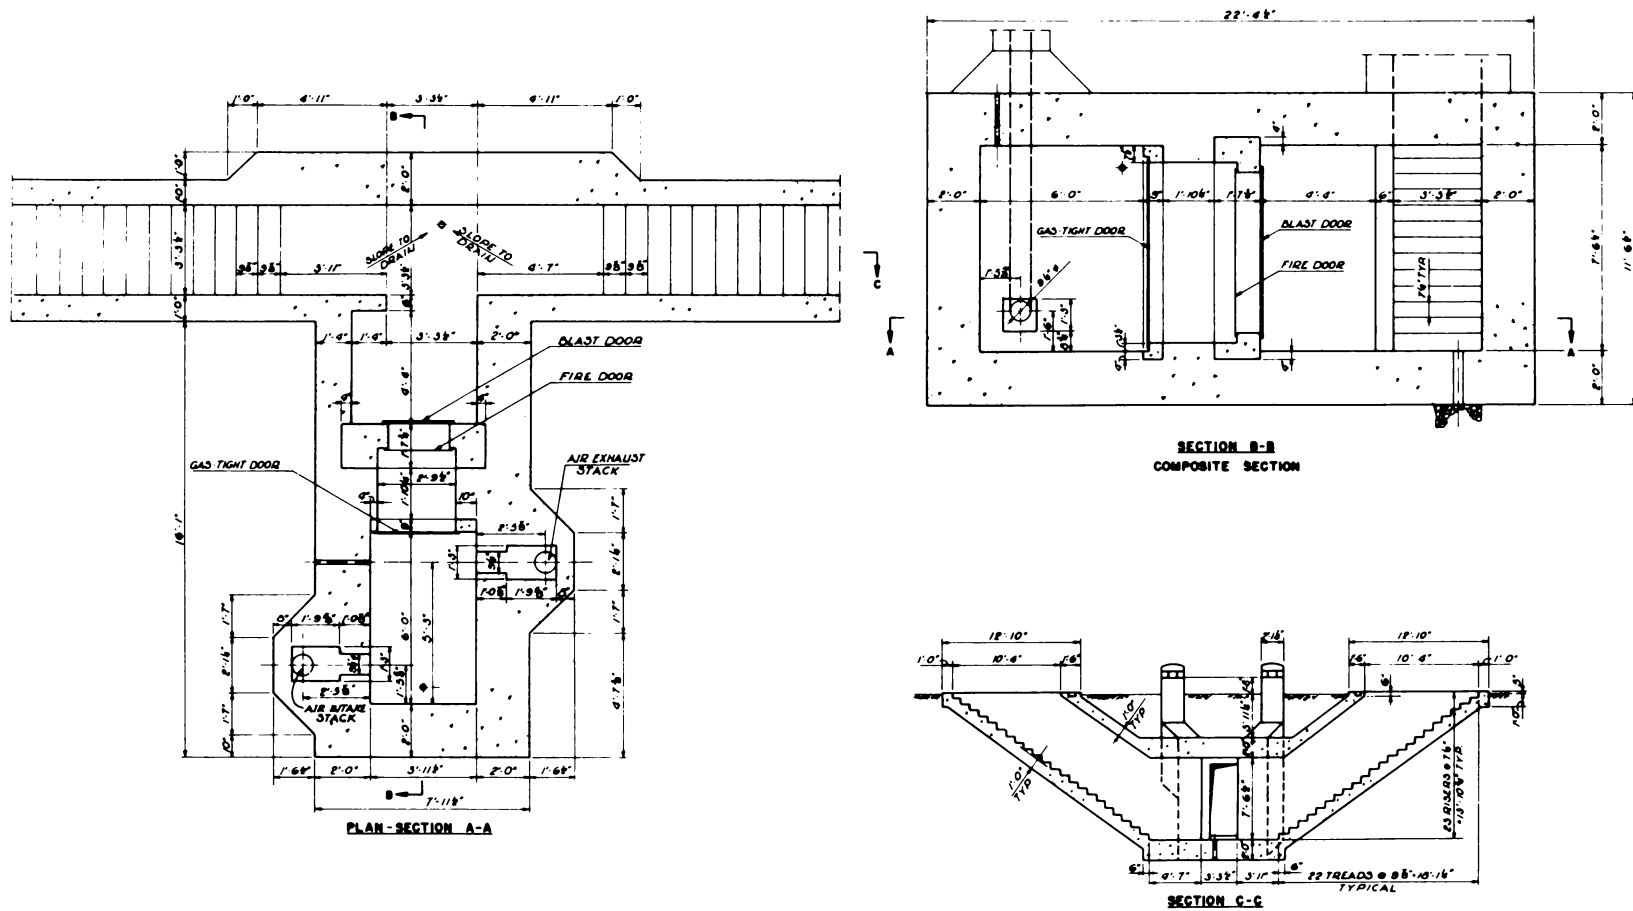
Entrance and entrance chamber, structure II-3, architectural layout.
